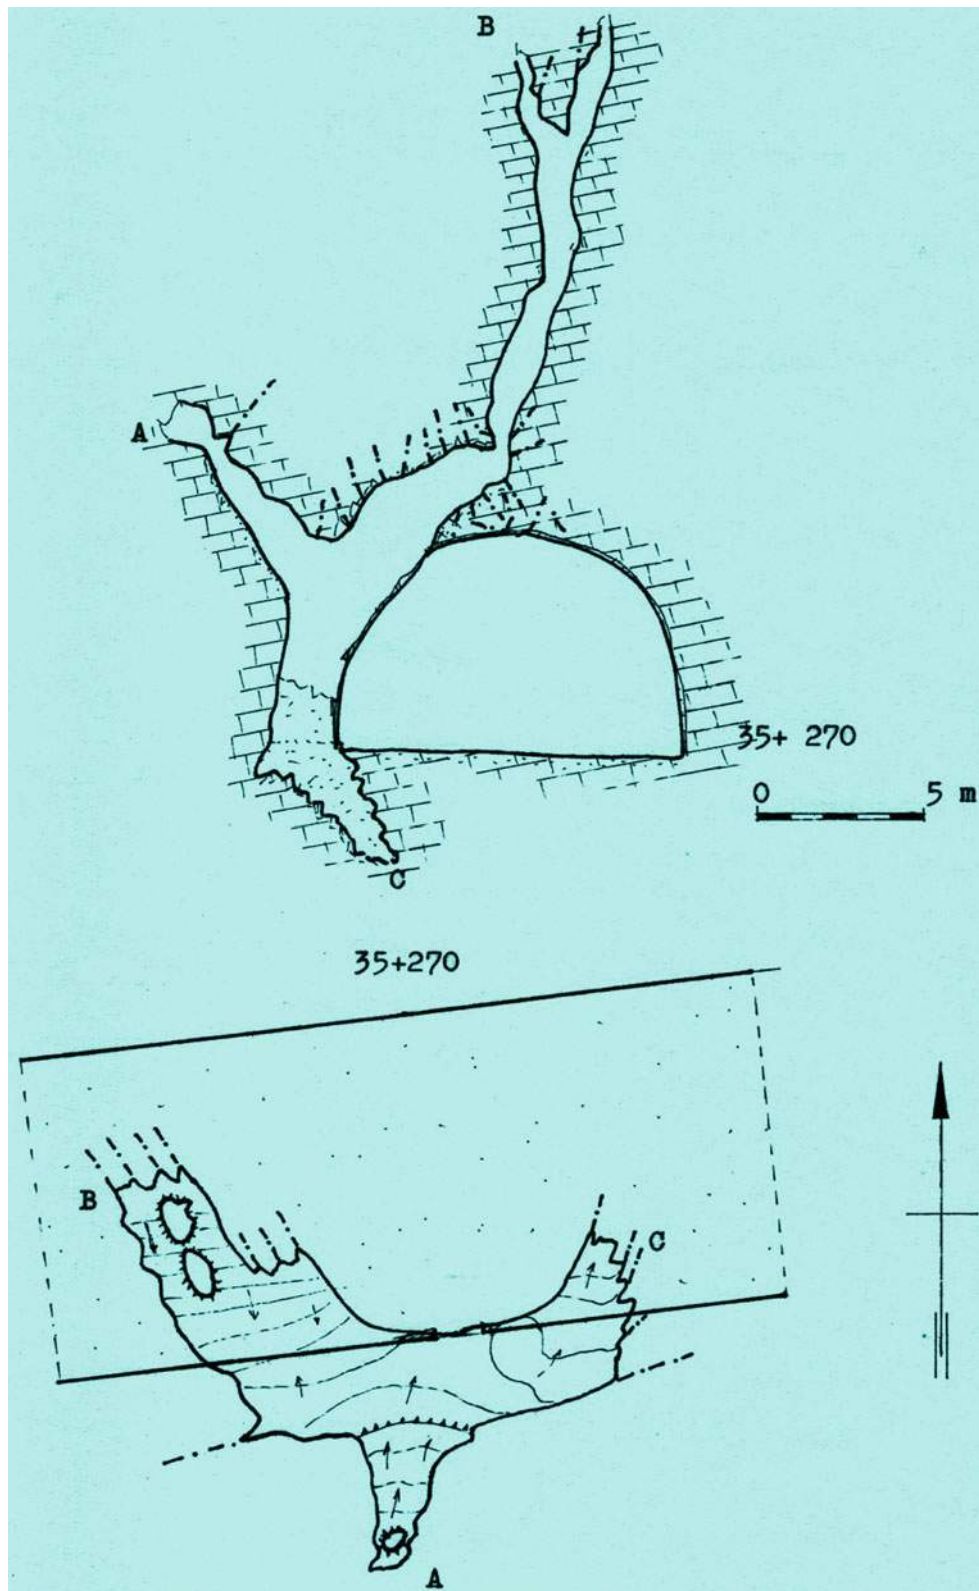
Profile and plan of cavern at km 35 + 270 in Sleme Tunnel
